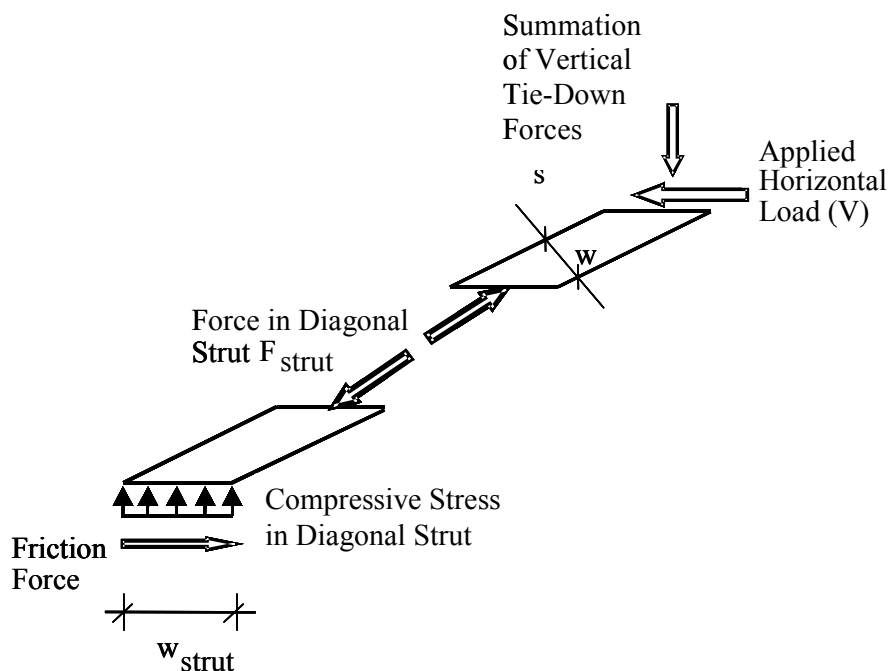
Diagonal compressive strut in an AAC shear wall
